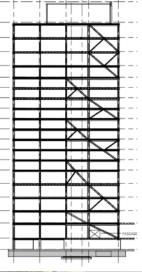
SIDE VIEW OF CONSTRUCTION SITE AT ICON.
